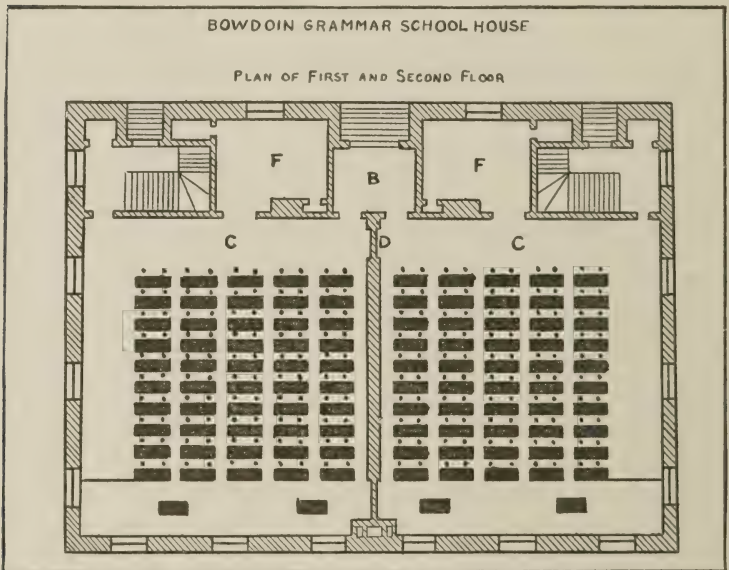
First- and second-floor plan of Bowdoin Grammar School, Boston, 1848.
